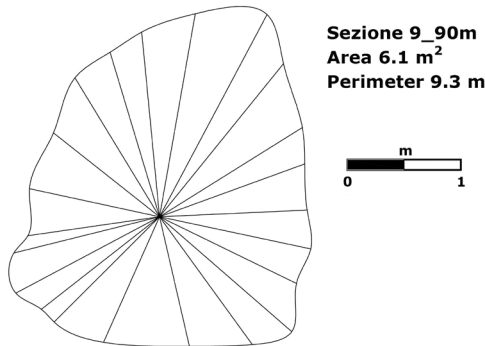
Example of a vertical cross-section surveyed in Baulmes Mine (Section\_9 at 90 m from the tunnel entrance).
